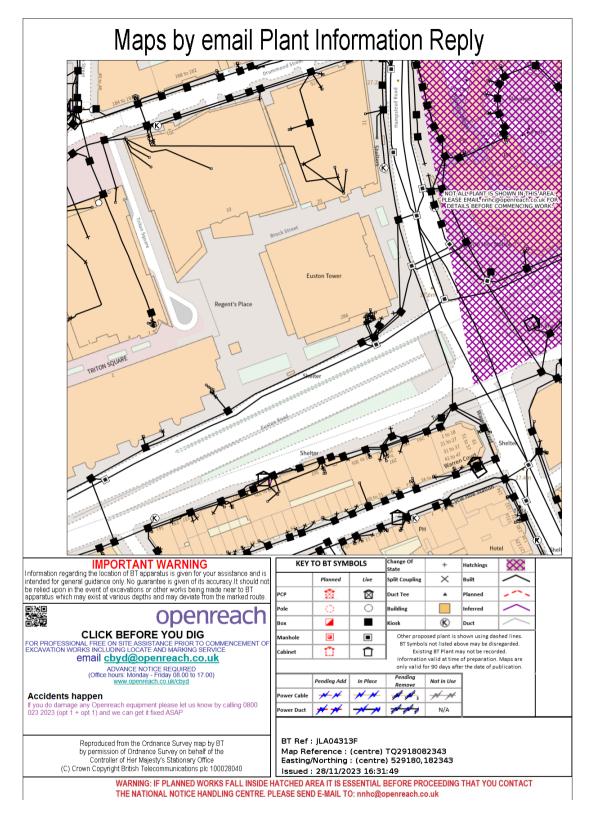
Existing BT openreach Fibre installed around the application Site and to the existing Euston Tower structure
